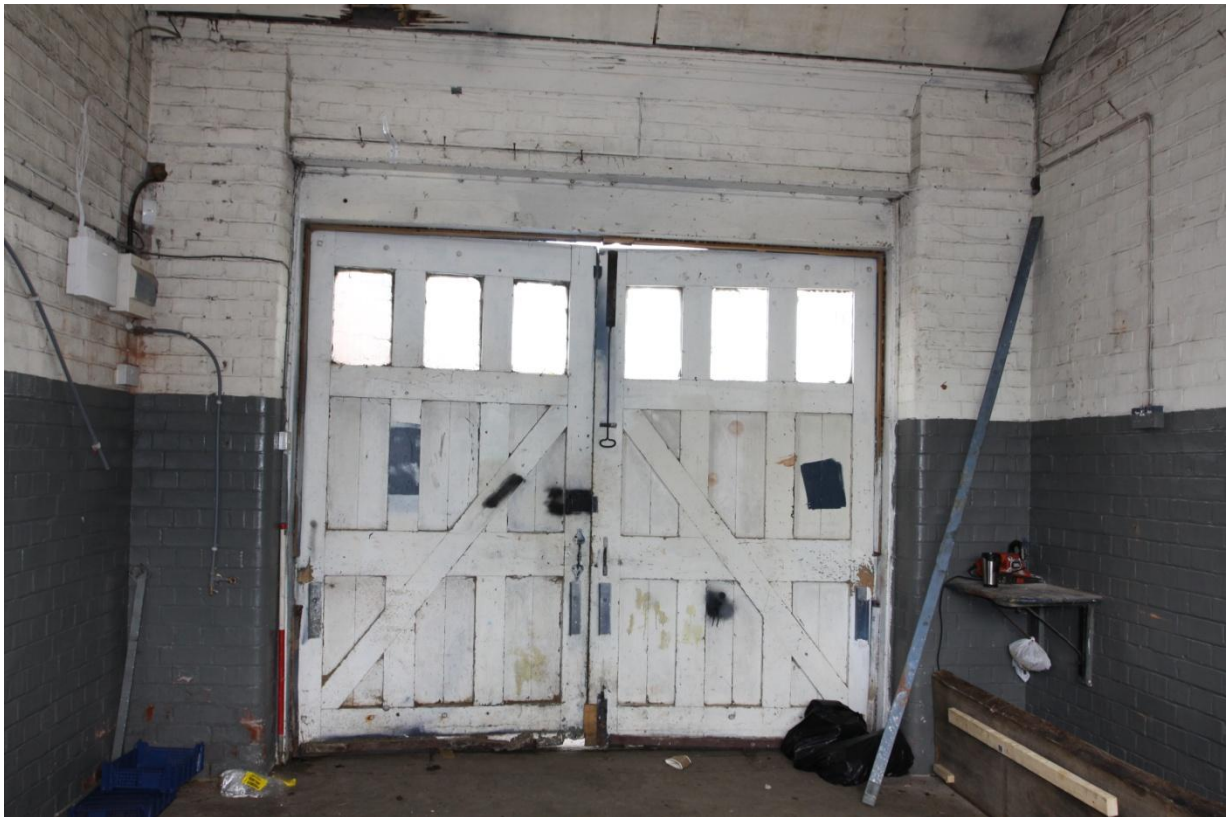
Interior view of the double wooden doors in Unit B, view north-west.
